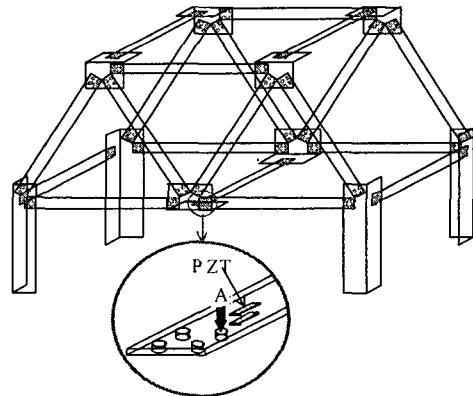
Sketch of the truss structure and position where the bolts and PZT are considered in experiment.
